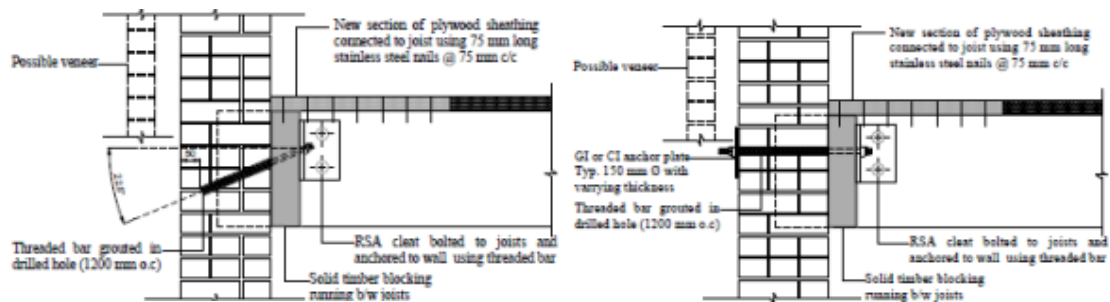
Anchored connection between masonry wall and floor joist using steel angle (NZSEE et al., n.d.-c)
